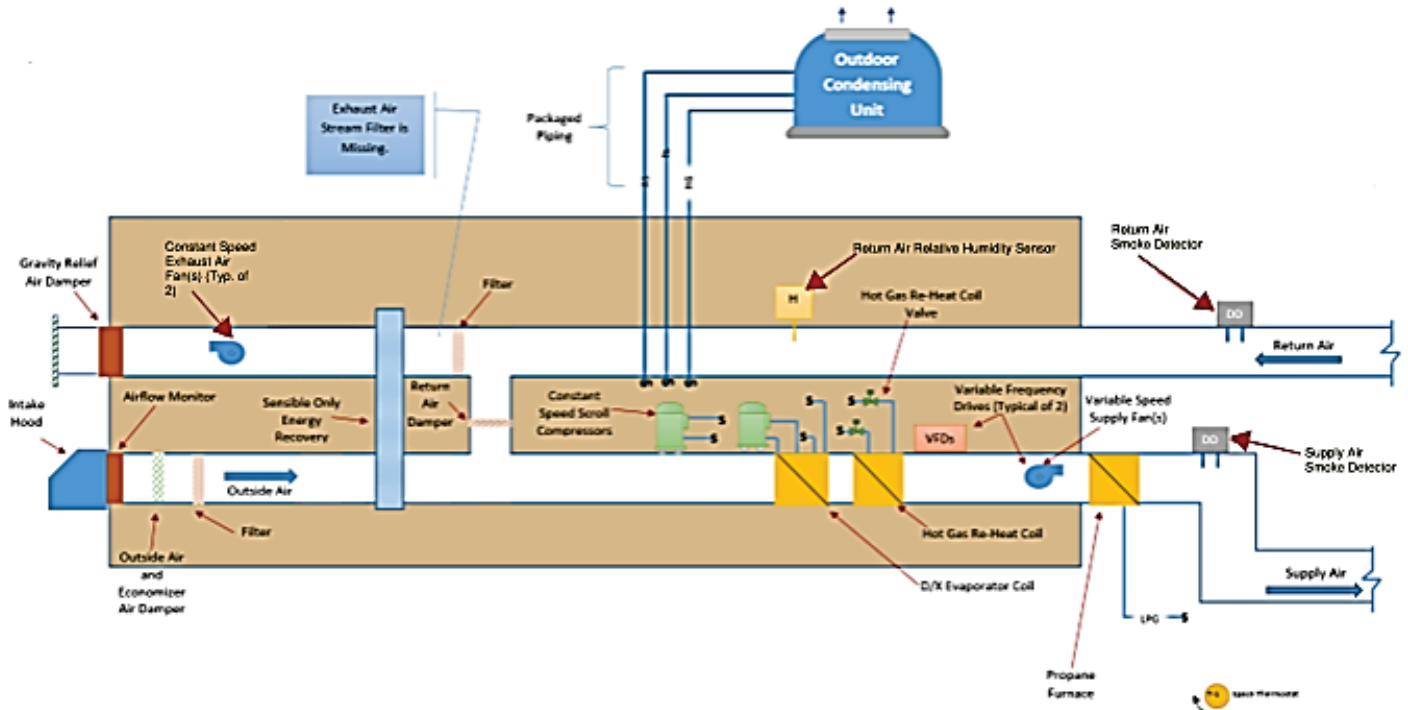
Typical Ground Mounted Packaged Rooftop Unit Schematic
